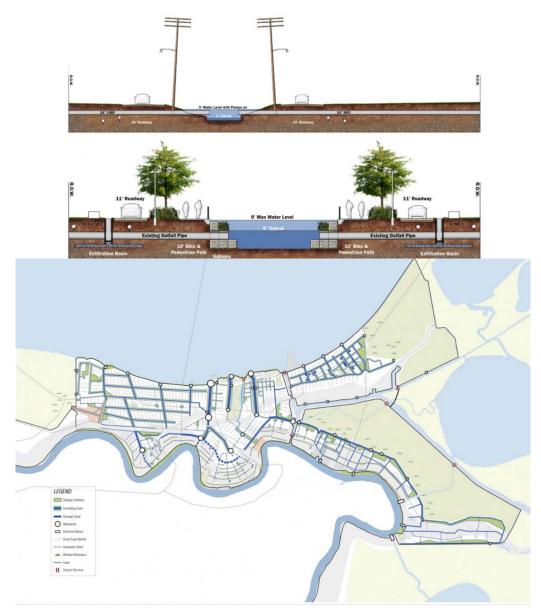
a, b, and c. New Orleans Canal Network Plan and Elevation Drawings from the Greater New Orleans Urban Water Plan⁶¹
